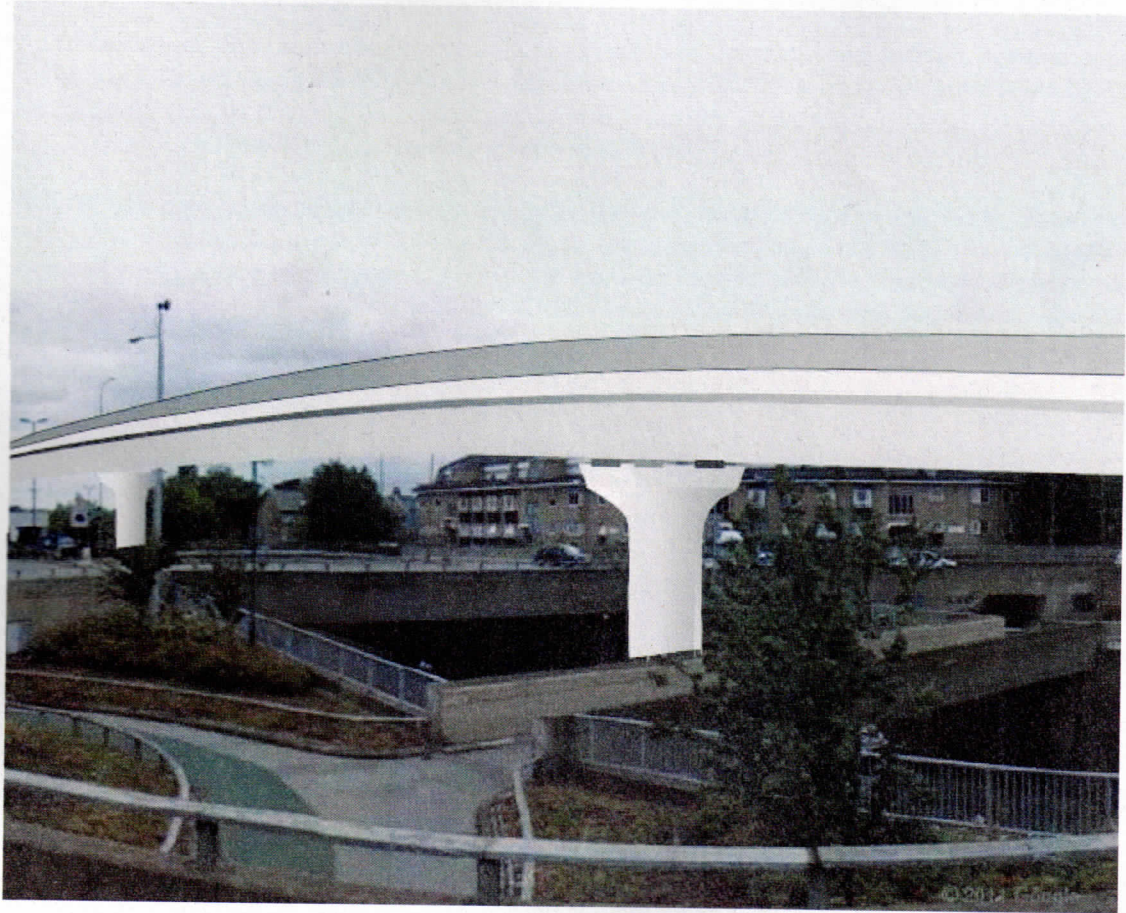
Artist's impression – Sun in the Sands, Elevated DLR Concept
